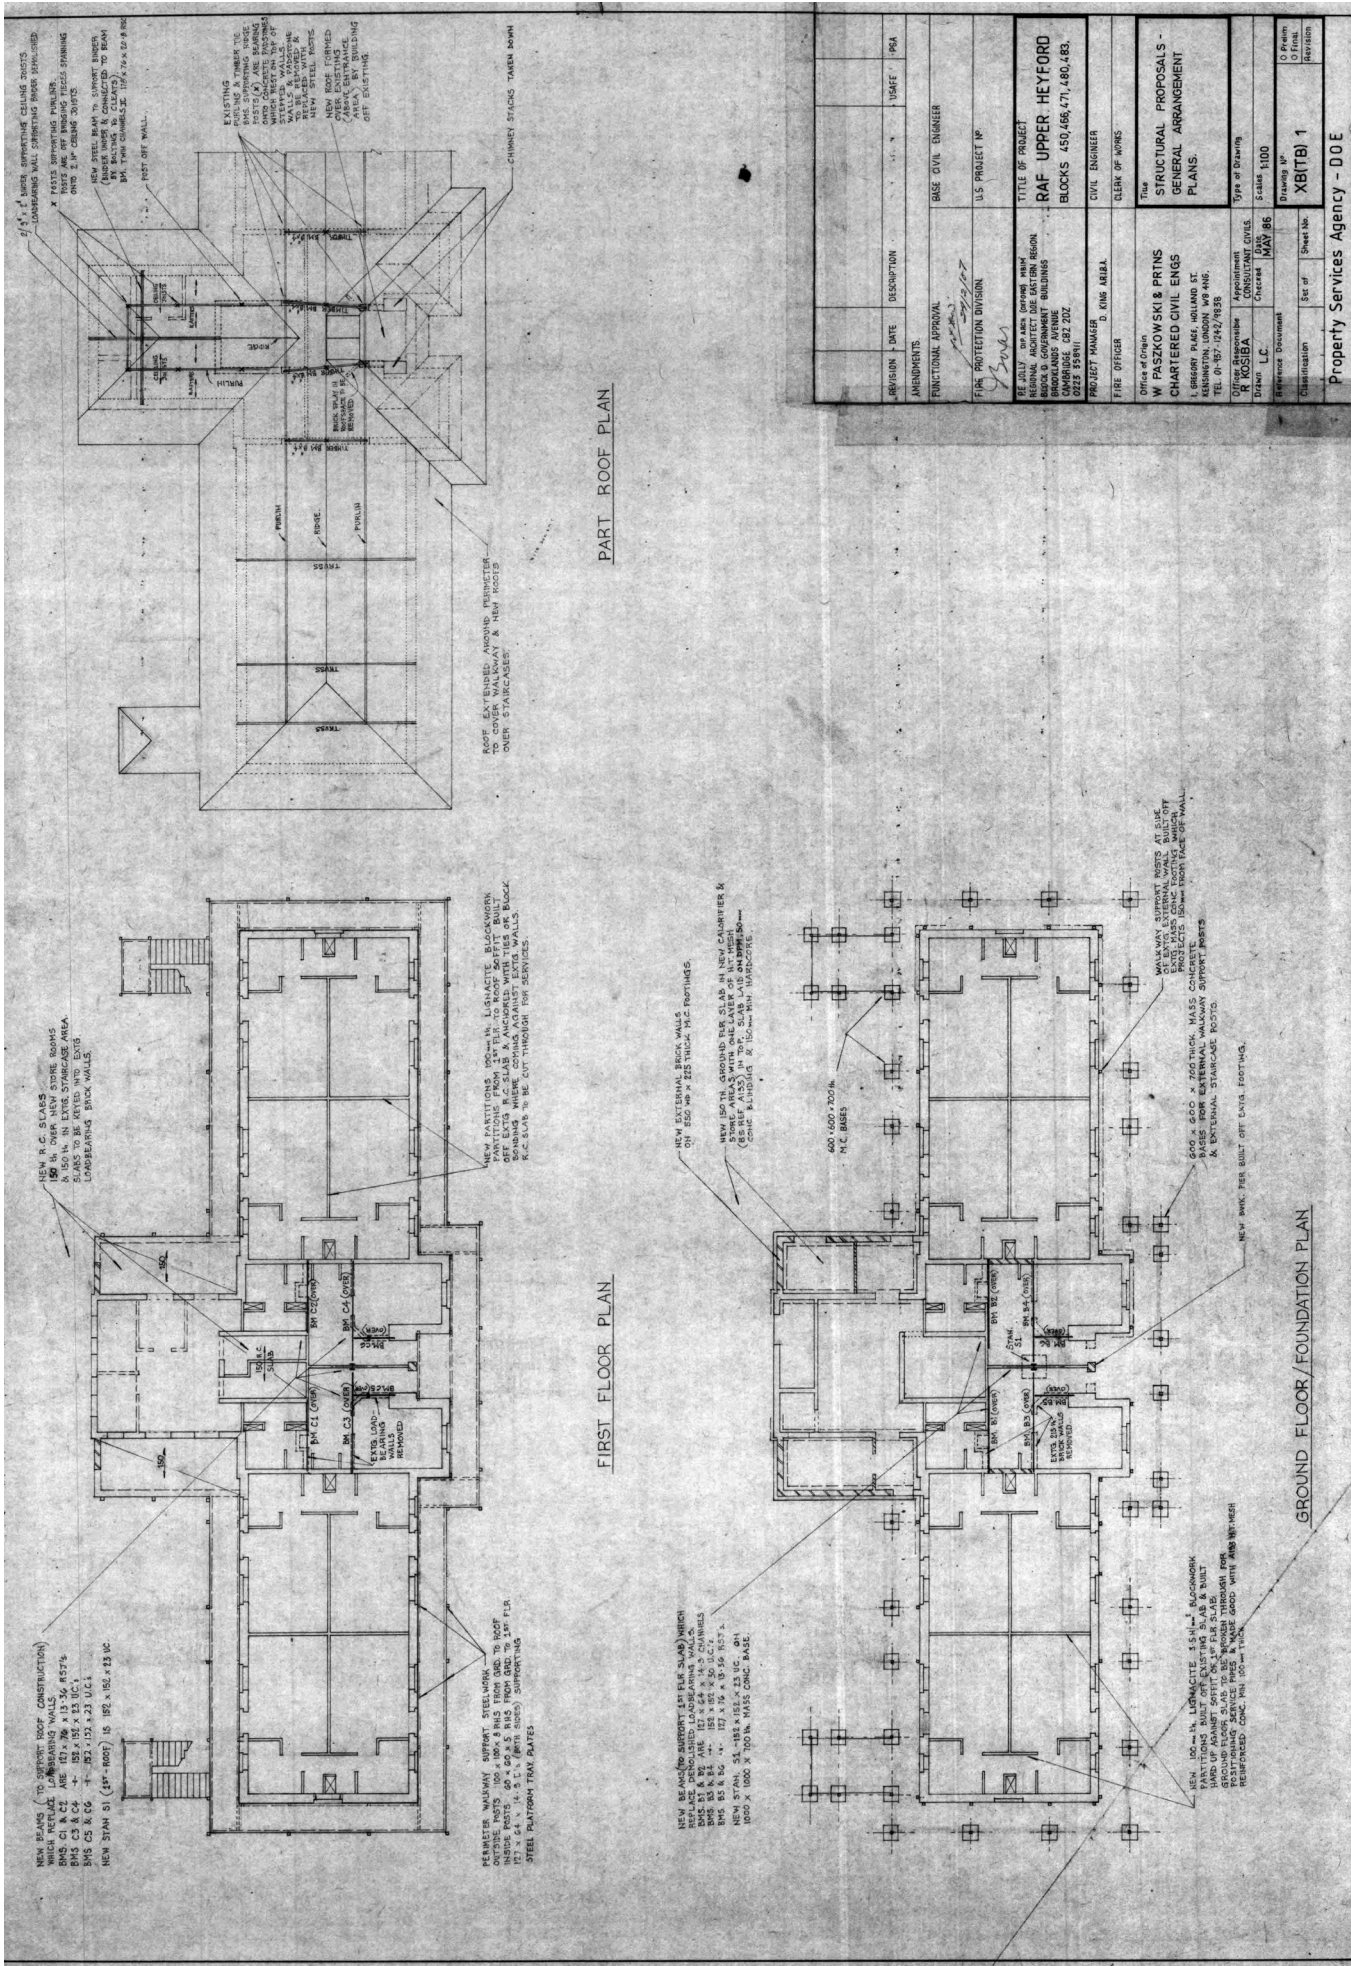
, 466, 471, 480, 483.1 C Type Barracks general arrangement plans
